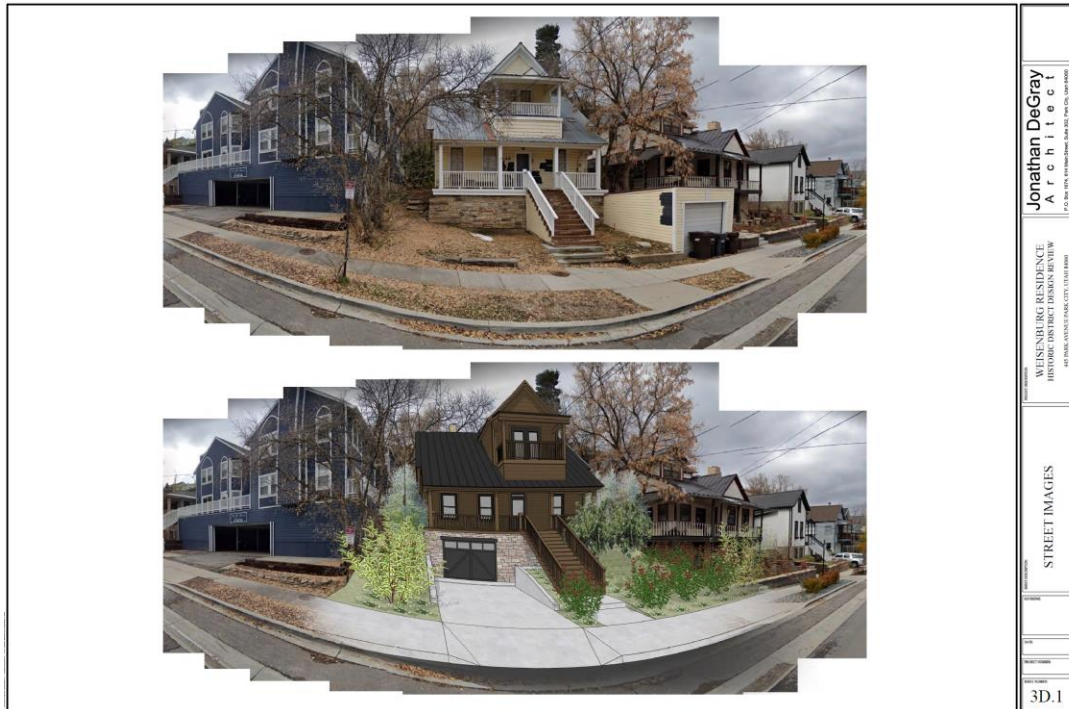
Applicant's Street Images Showing Existing and Proposed Structure
